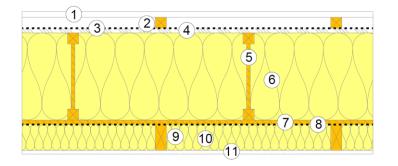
Wall section detail of the Fort St. John home in plan view (vertical TJIs).
